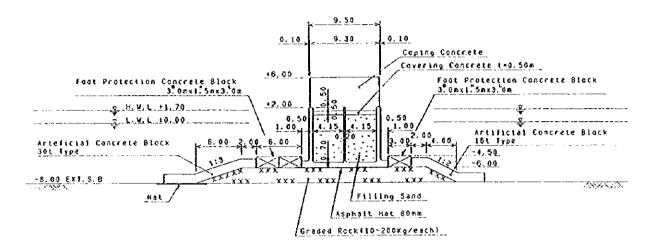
(5) Typical Cross Section of Breakwater 4 (RC Caisson)
